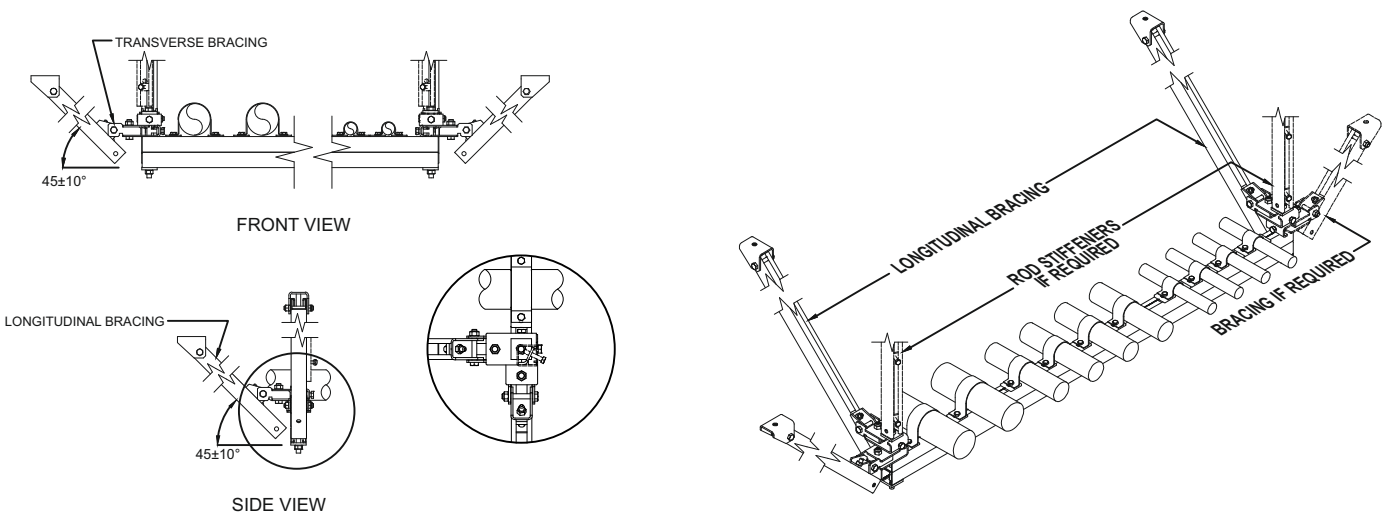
Multiple Pipe Fixings on Trapeze Assembly
